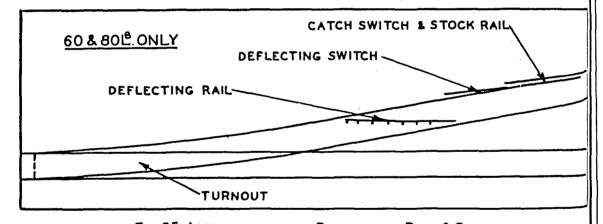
ARRANGEMENT OF DEFLECTING RAIL & SWITCH
